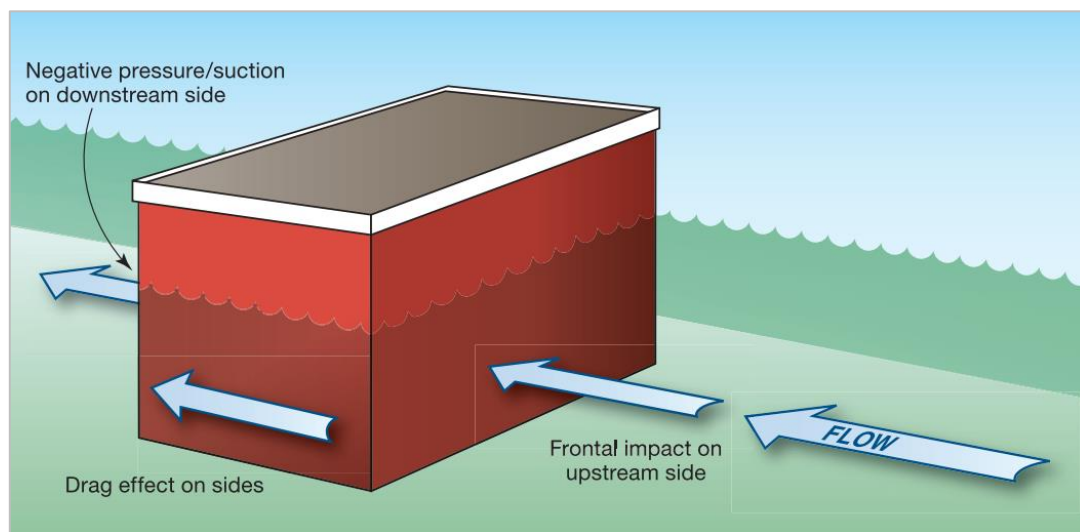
Hydrostatic forces (Source; [Protecting Building Utility Systems from Flood Damage](#))
